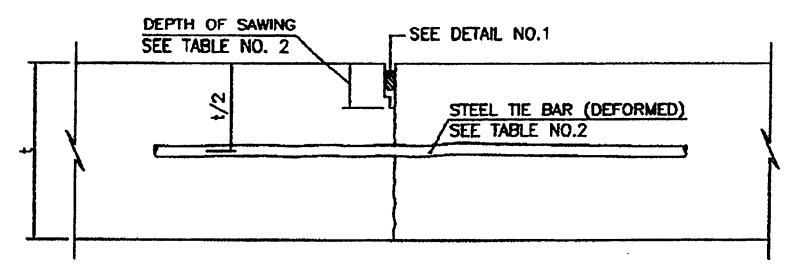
DETAIL OF CONSTRUCTION JOINT AT END OF CONSTRUCTION OPERATION
